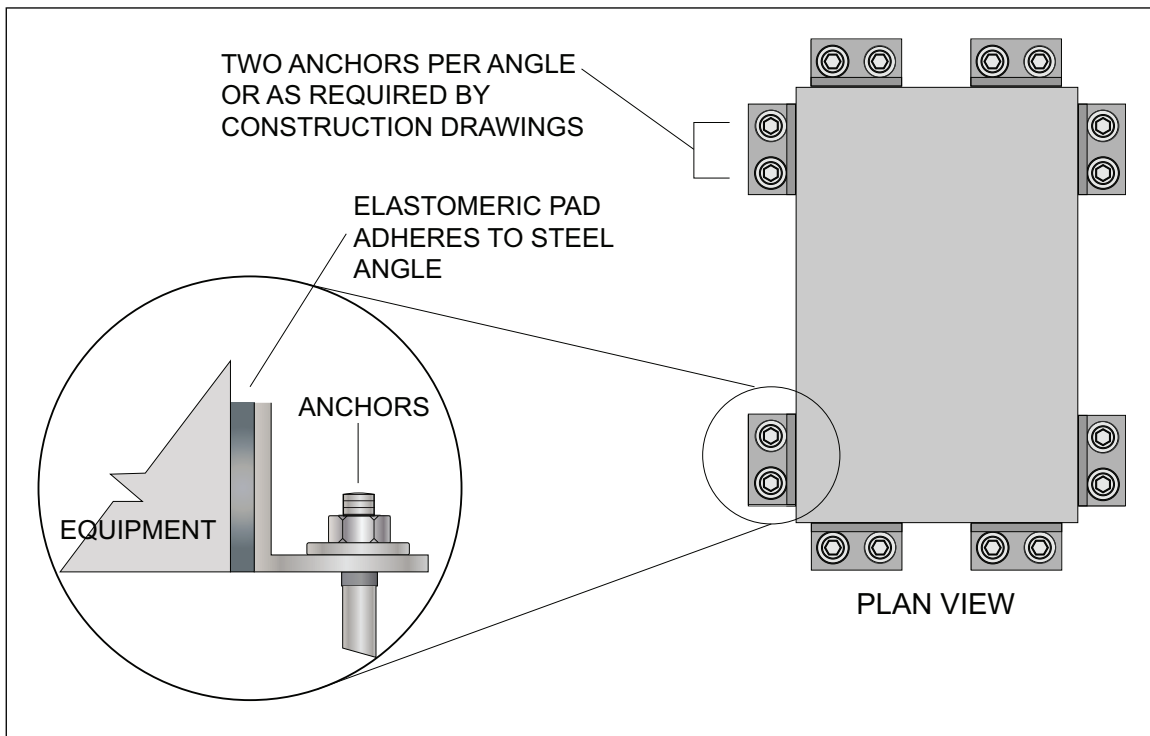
D. Schematics of equipment installed with bumpers (Figure 77 from FEMA 412)
